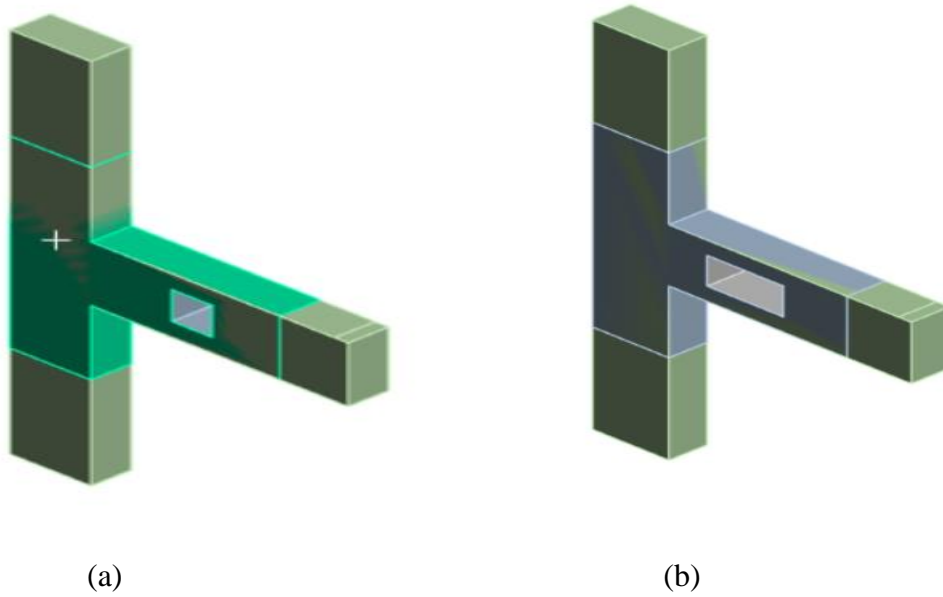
FRP retrofitted beam column joint with opening (a) Square (b) rectangle
